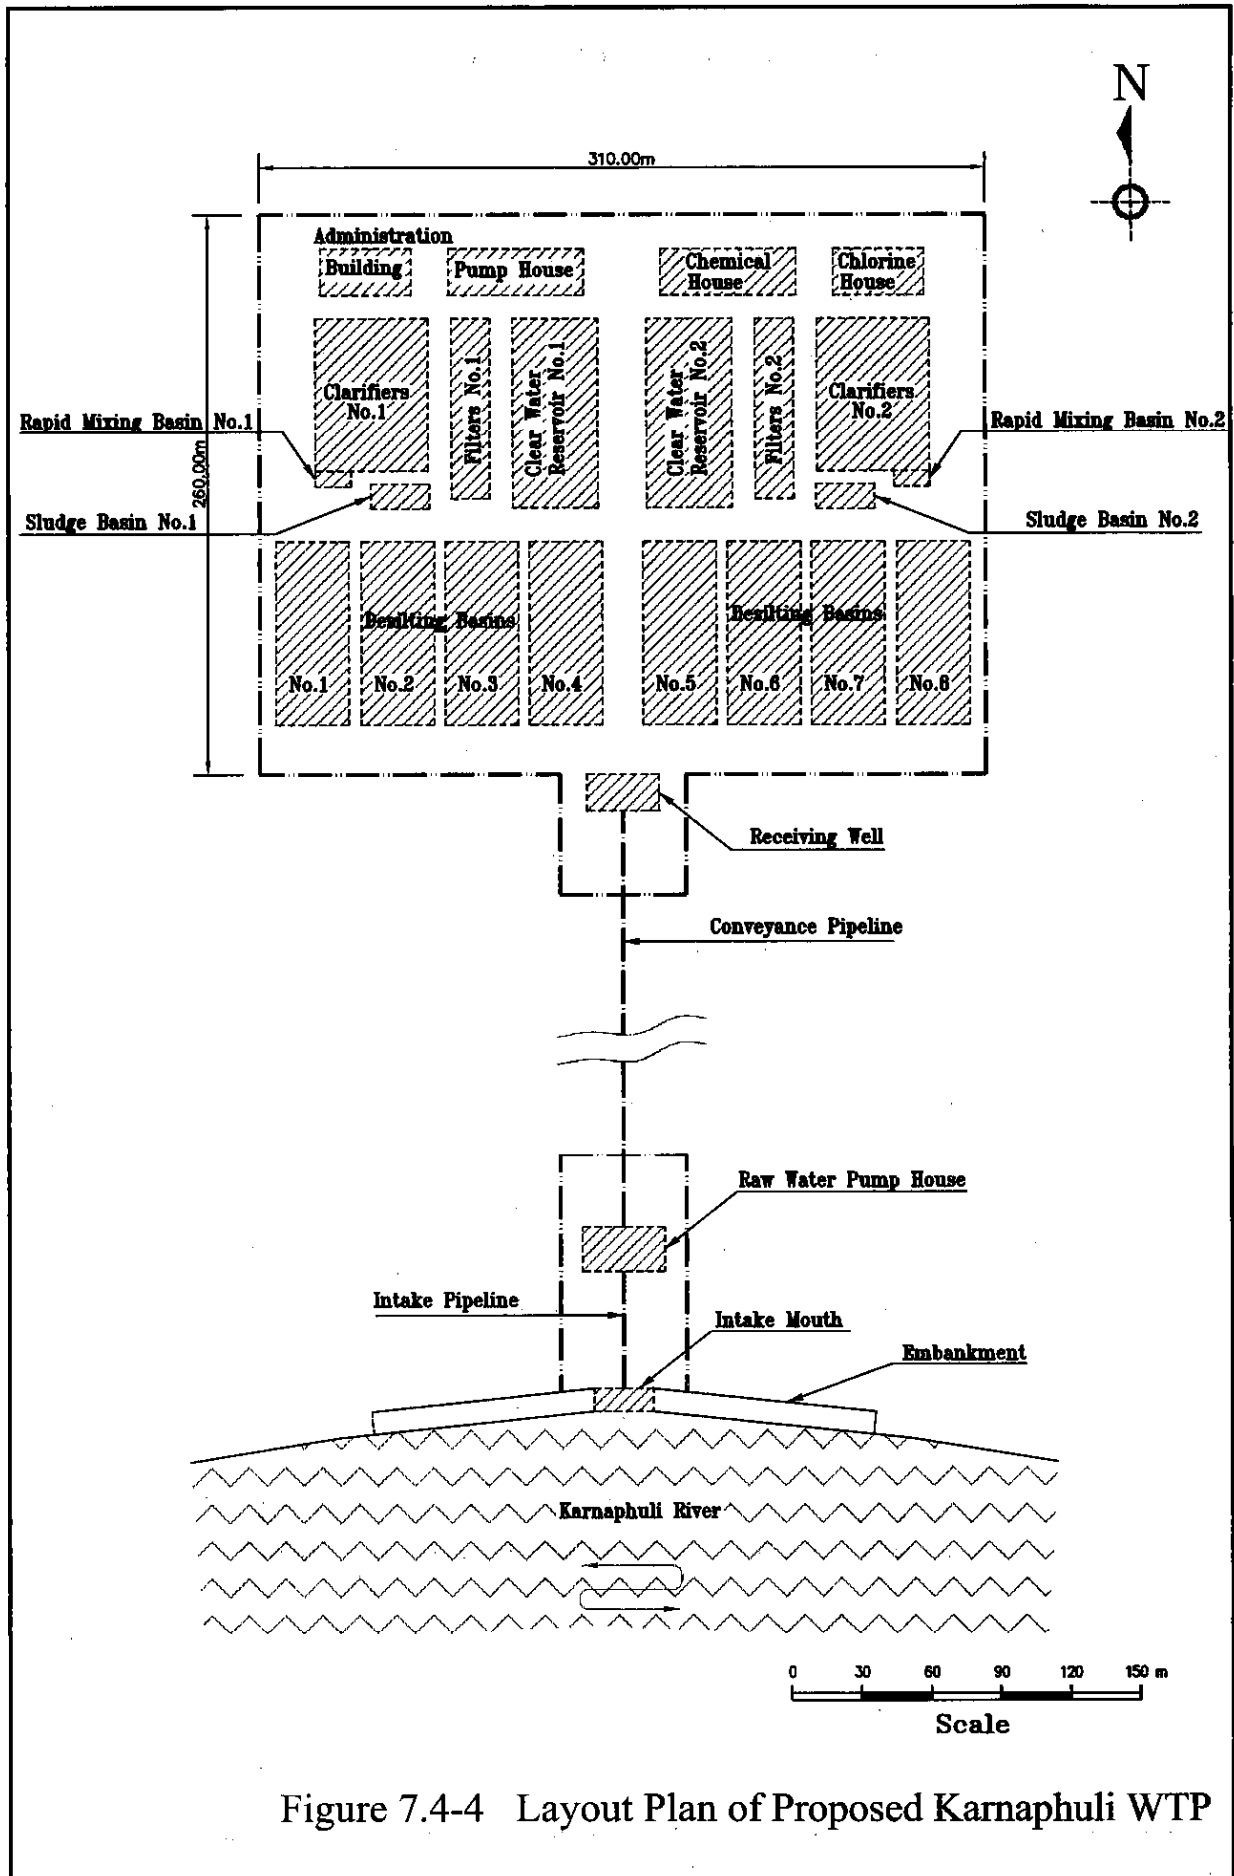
Layout Plan of Proposed Karnaphuli WTP
